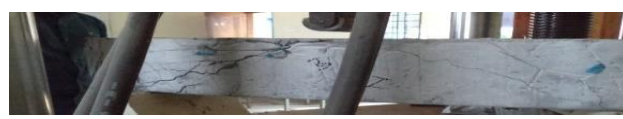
(d). Failure mode for reinforced concrete beam sample cast with F10R10S5 (Siddika *et al.*, 2021).
